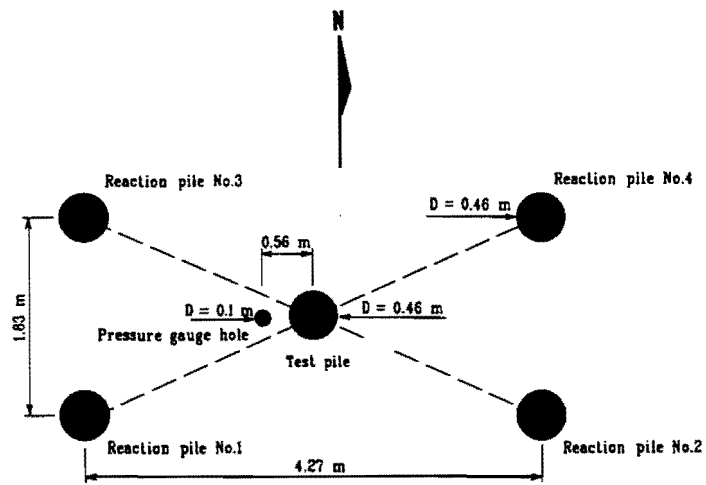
Layout of test pile and reaction piles (Baytown)
